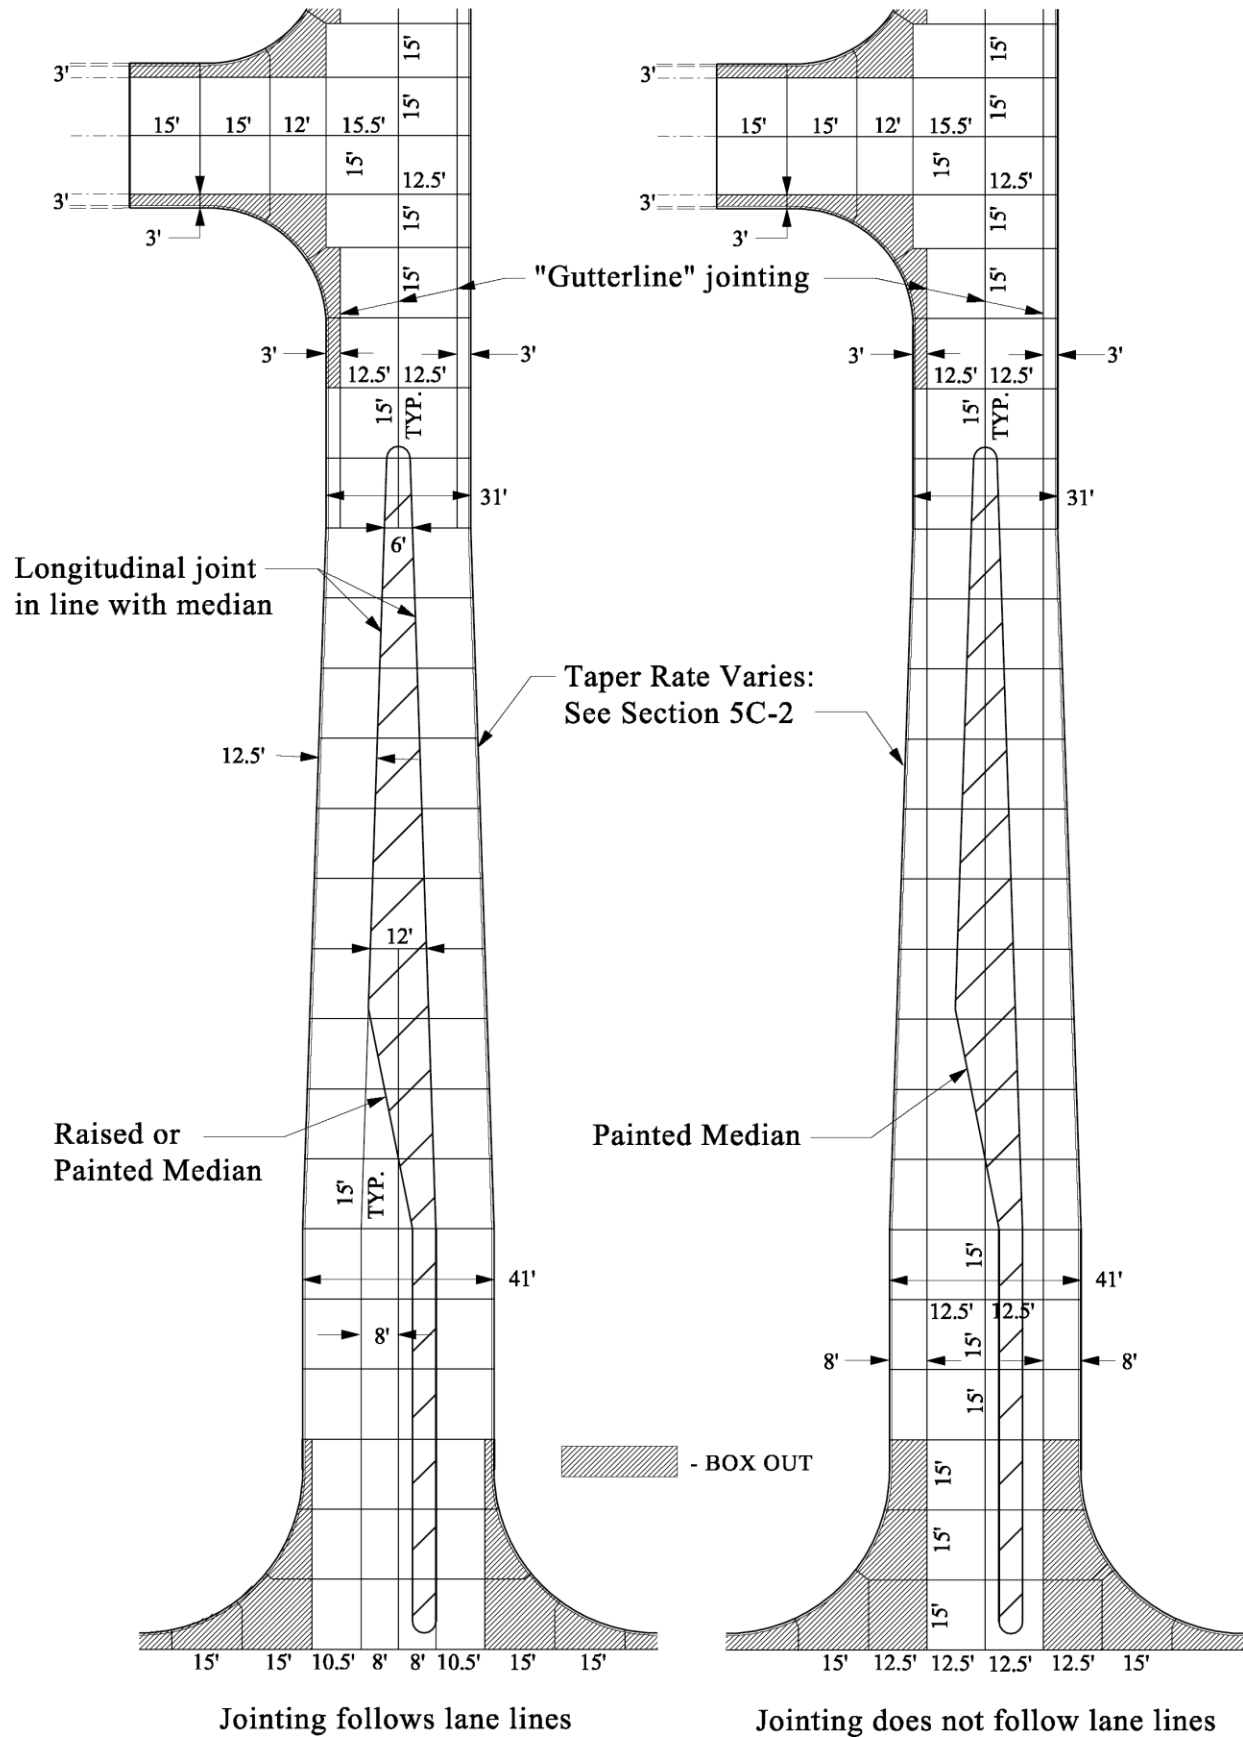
G-3.08: Gutterline Jointing - Concentric Widening (31 Foot to 41 Foot)
